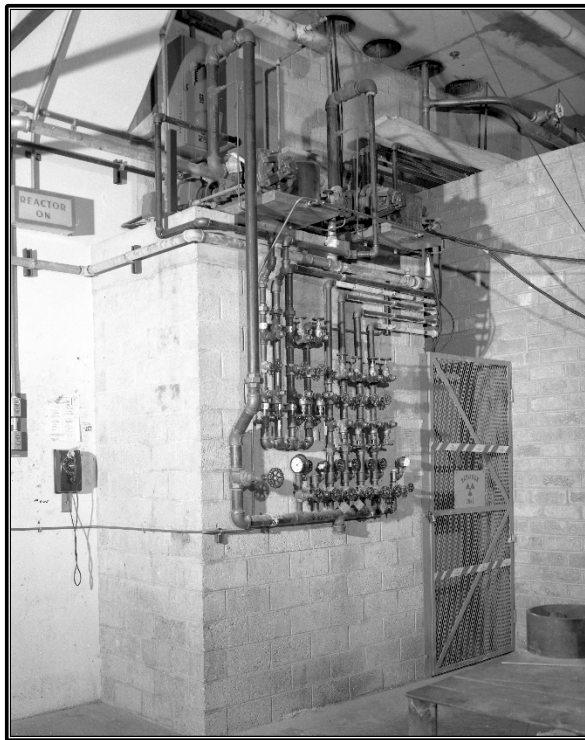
Archival photograph showing control valves on a wall of the ORR substructure in the basement of Building 3042, circa 1960 (ORNL Photo 52496).
